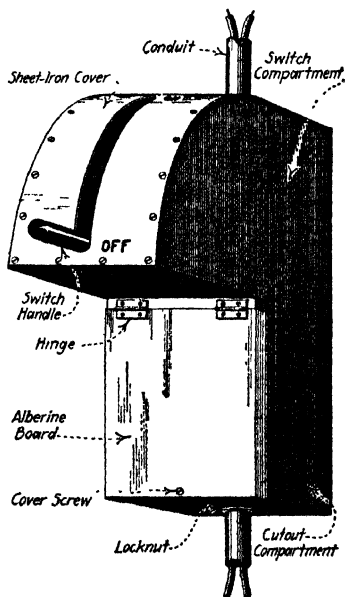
Improvised enclosing case for single-throw switch and cutout. This is constructed of alberine board and sheet metal.
